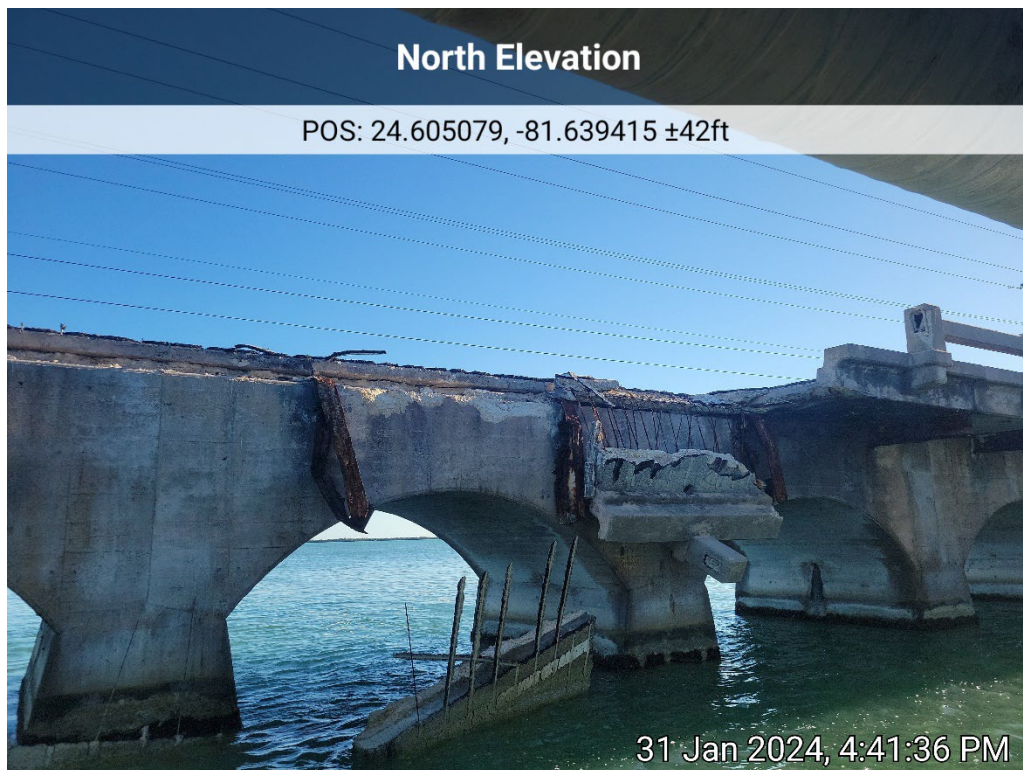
Northwest side of bridge with collapsed deck and steel beam supports.
